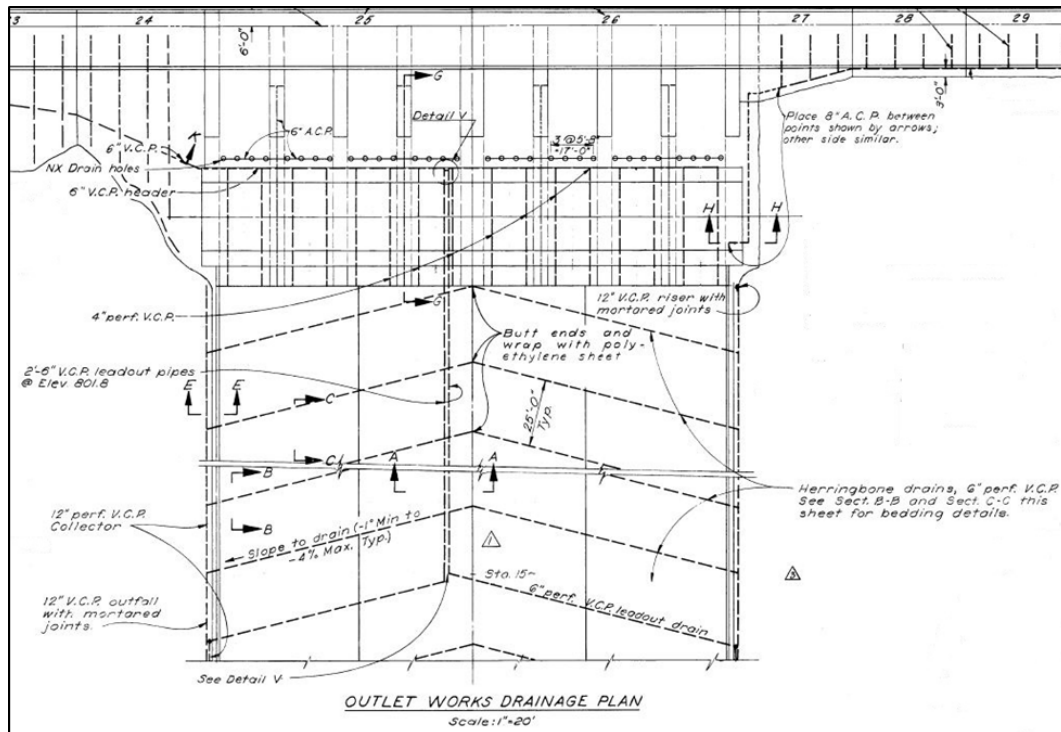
Plan view of headworks (top) and upper spillway chute showing herringbone and collector drains (from Drawing A-3B5-3) [5]
